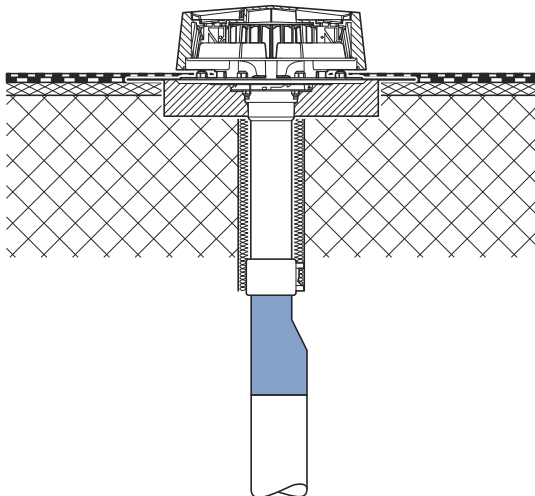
Connecting the Geberit Pluvia outlet with an expansion
